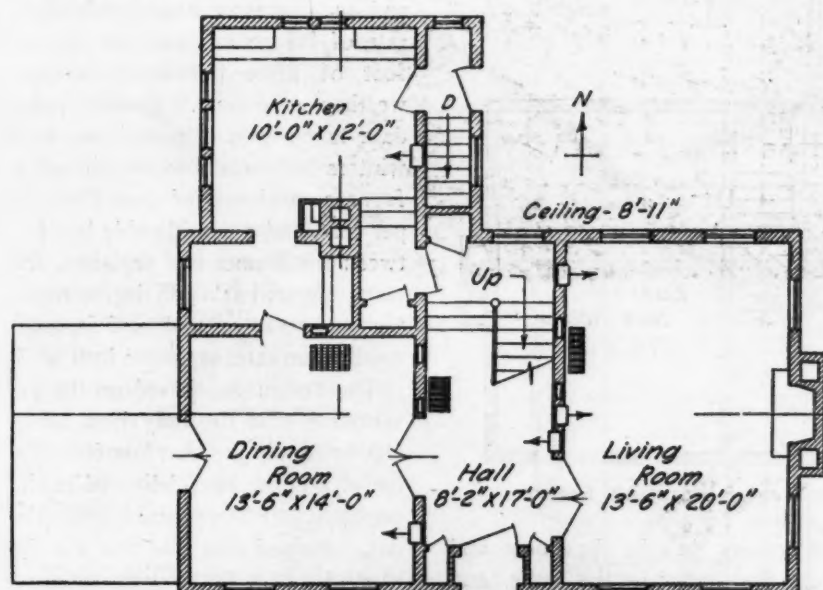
First Floor Plan with Location of Warm Air Registers and Cold Air Return Grilles (For Third Installation)
